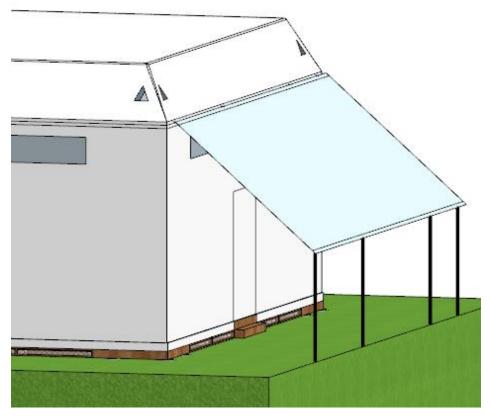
3D sketch showing possible shading outside the project with hangs and wooden masts.
